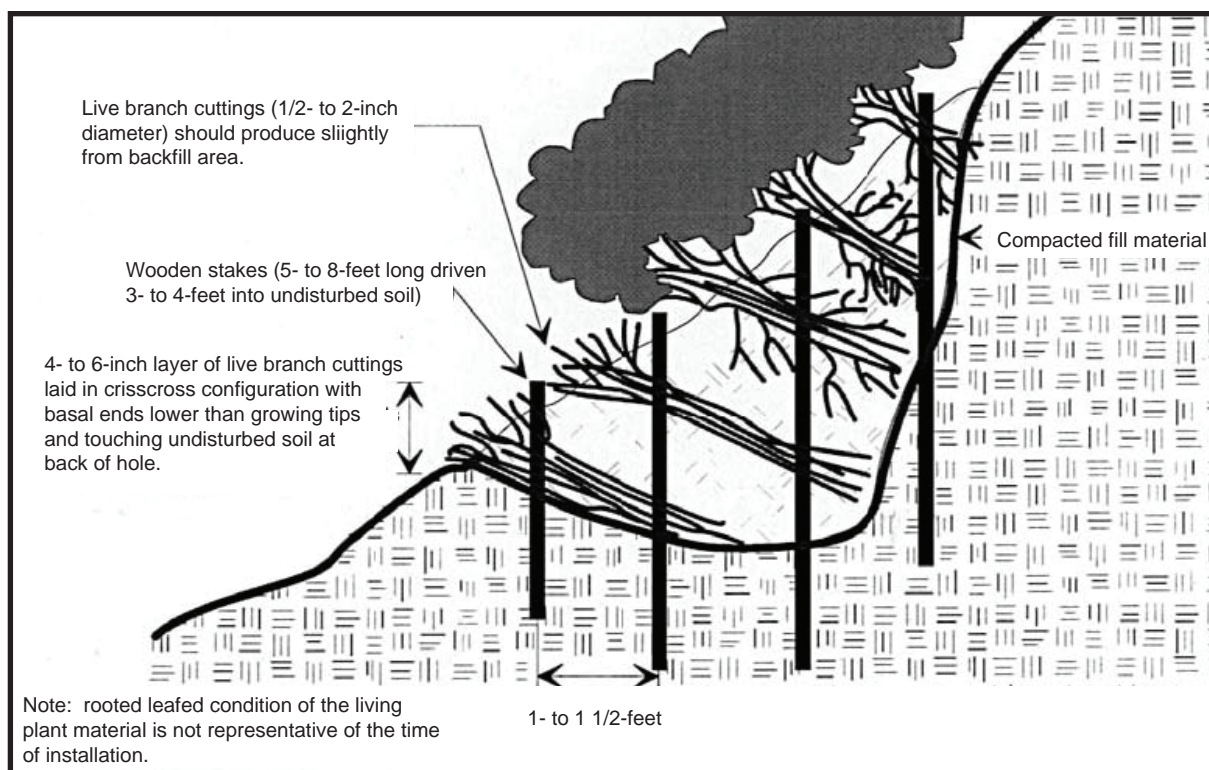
Typical branchpacking cross section. Source: NRCS Engineering Field Handbook, 1992.
